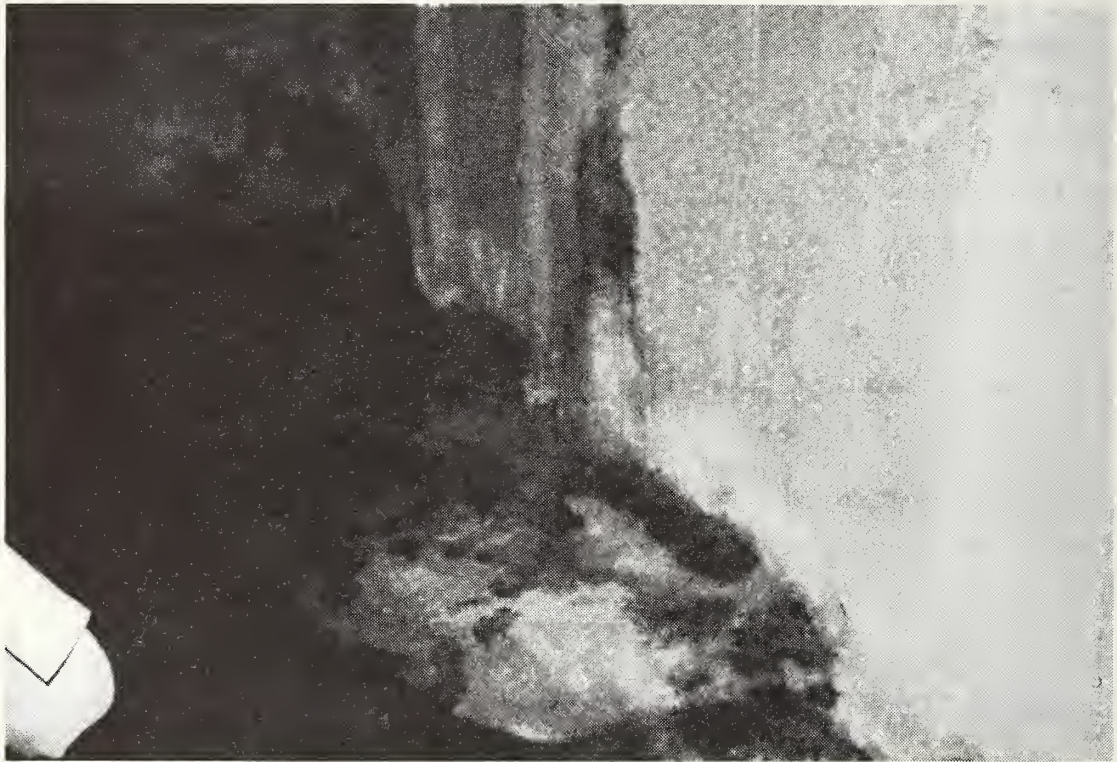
WATER INFILTRATION (BERGEN STREET STATION)
